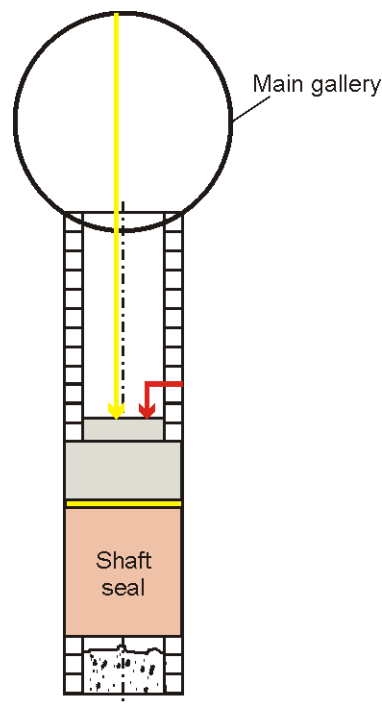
Position of the fixed points of the displacement sensors on the top of the shaft seal: GLÖTZL potentiometer (red) and wire-extensometer (yellow).
